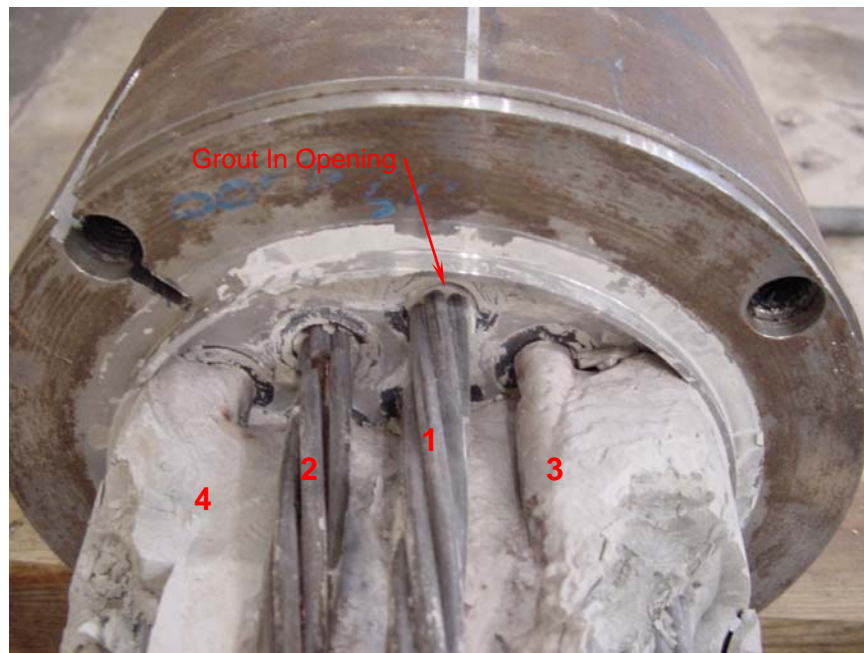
Grout Void at the Tower Anchorage – Specimen #1
